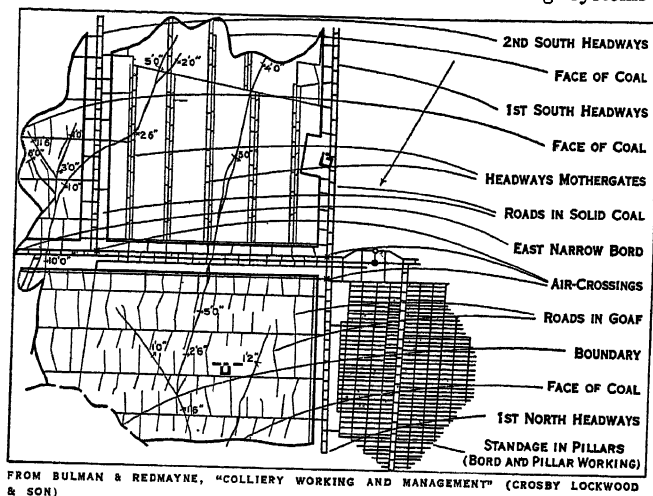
B.—THE LONGWALL SYSTEM OF WORKING
